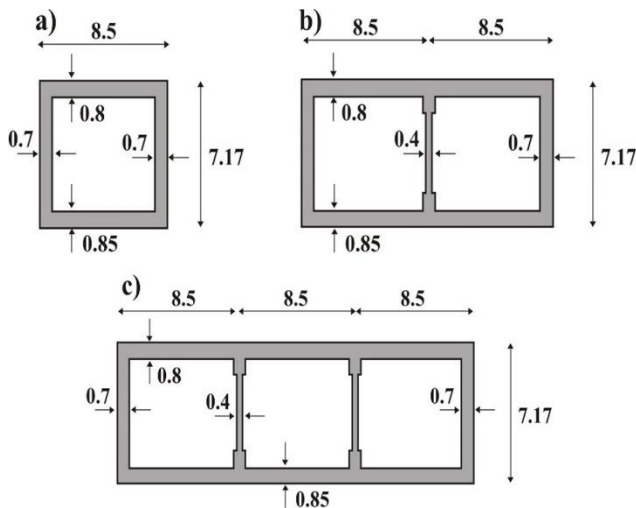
Dimensions of underground structure (in meter) with (a) 1 span, (b) 2 spans, and (c) 3 spans
